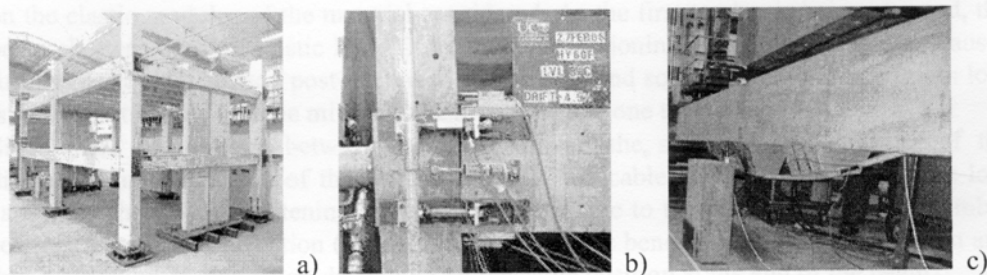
Unbonded post-tensioned timber frames and beams: a) Pres-Lam timber building tested for earthquake loads [9]; b) Rocking connection; c) Post-tensioned timber beam tested for vertical serviceability loads.
